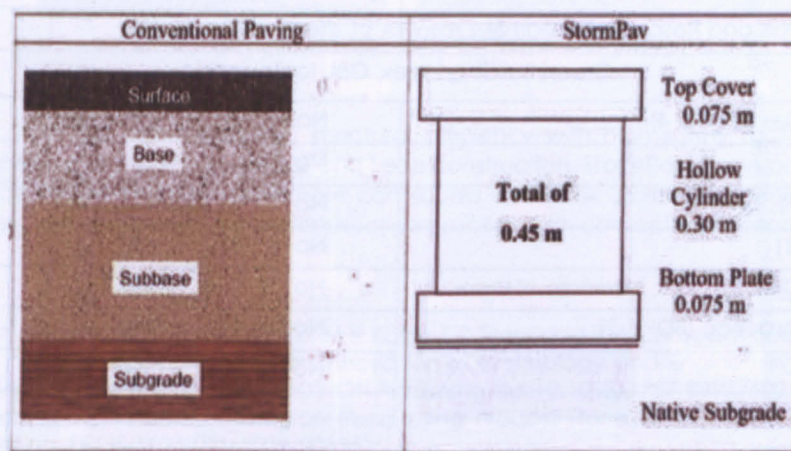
Typical arrangement of both conventional flexible and StormPav green pavement
